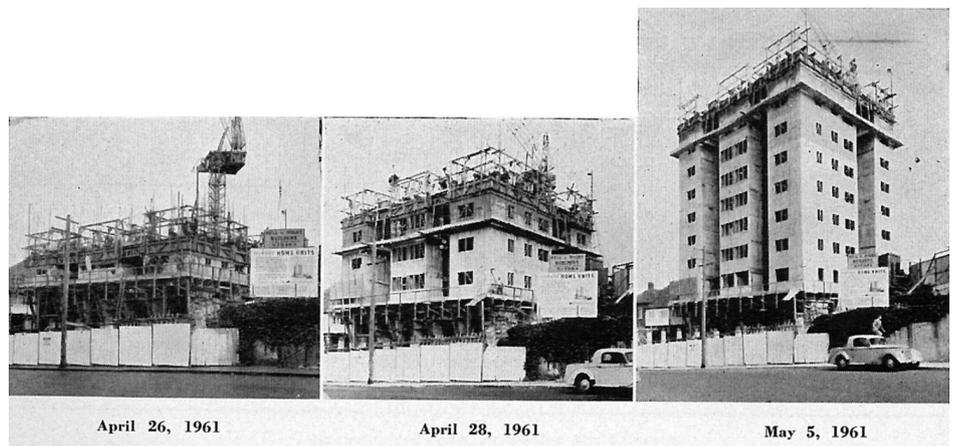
Tatlow Court Apartments, Neutral Bay, Sydney, 1961 (Donald, Woods, Sloane and Gallagher Architects). Photo-sequence of the slip-formed construction used by builder Kell & Rigby and sub-contractor Concrete Silos Pty Ltd. Reproduced from: *Constructional Review*, December 1961, 16.
